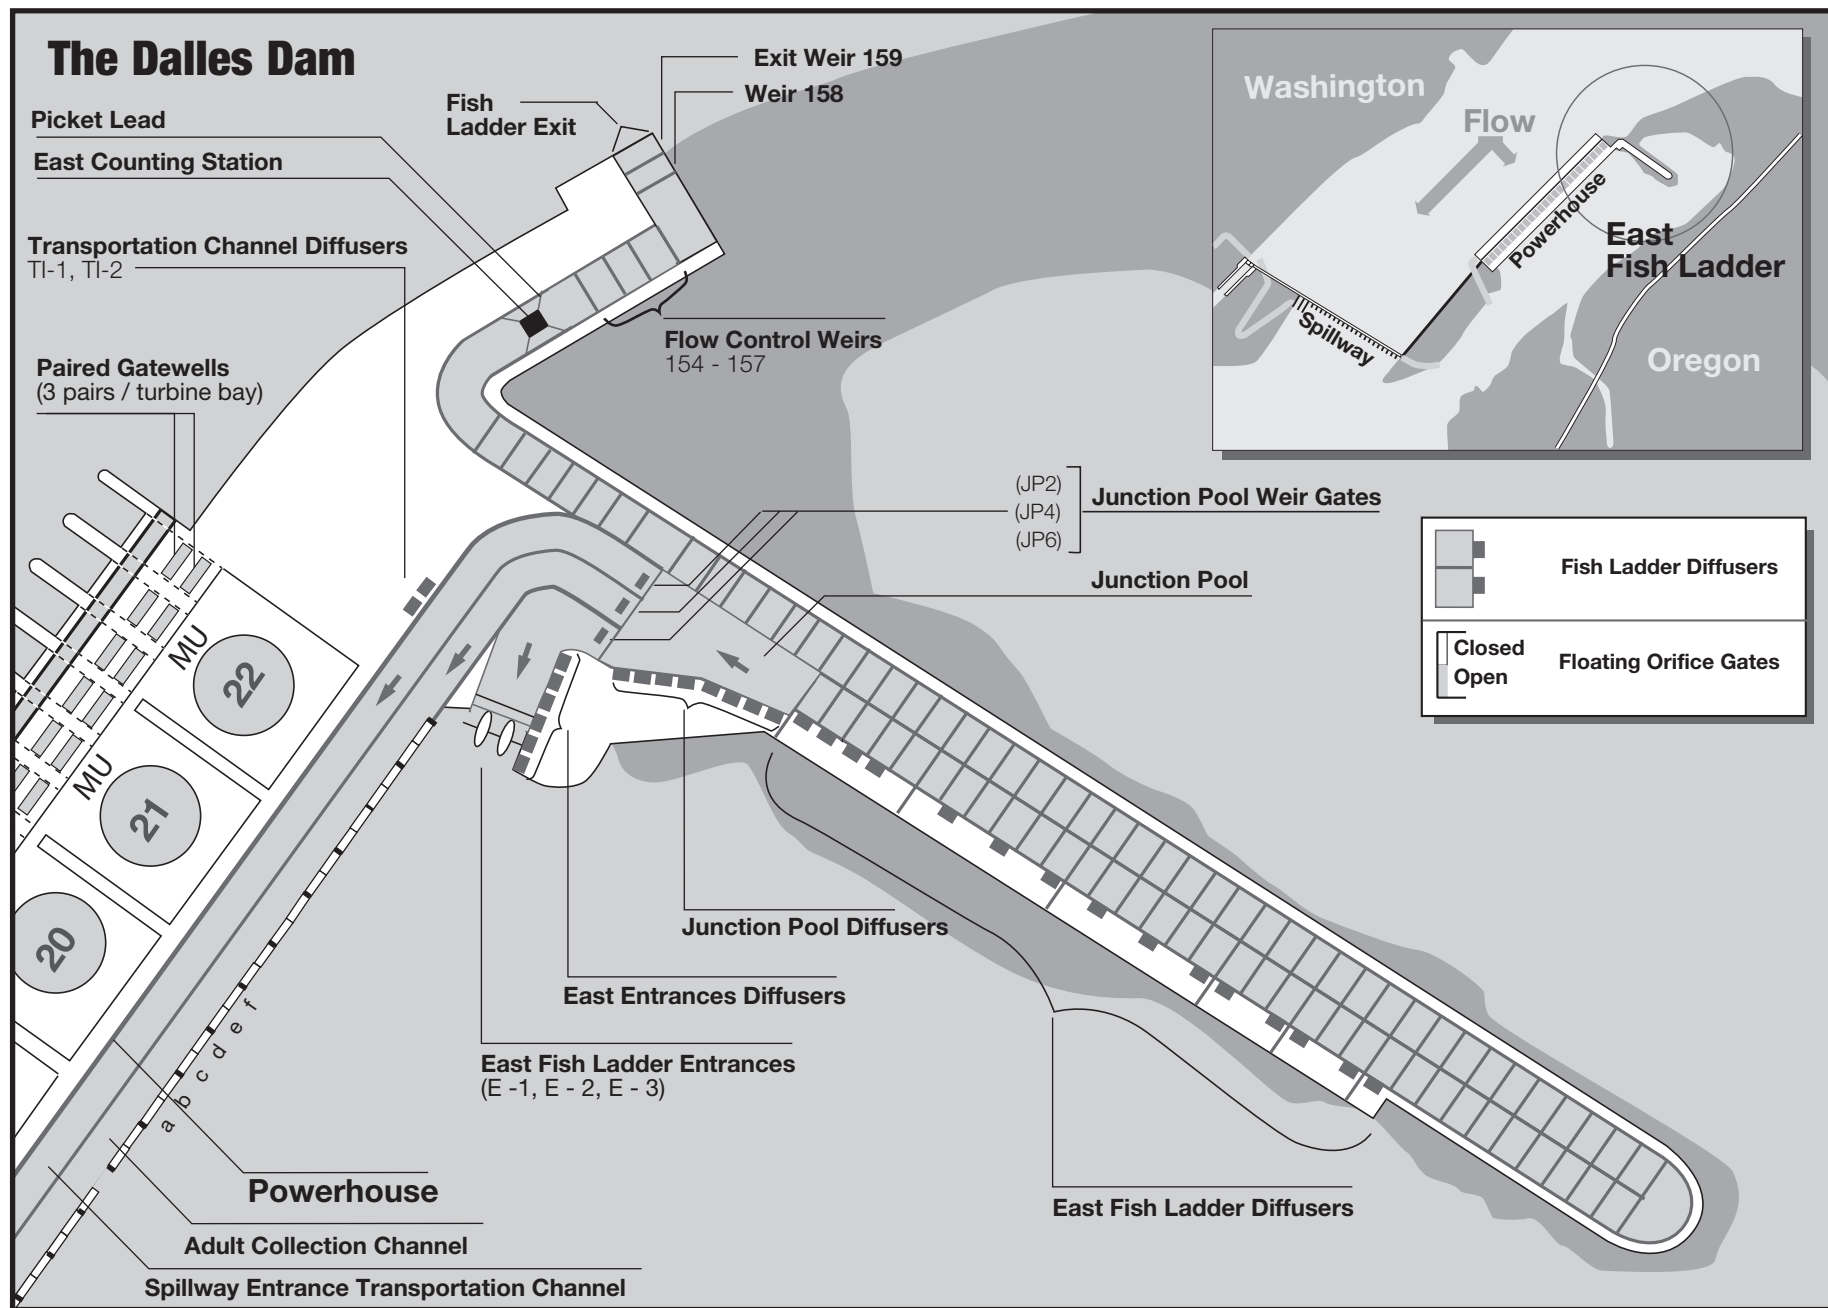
The Dalles Dam East Fish Ladder.
